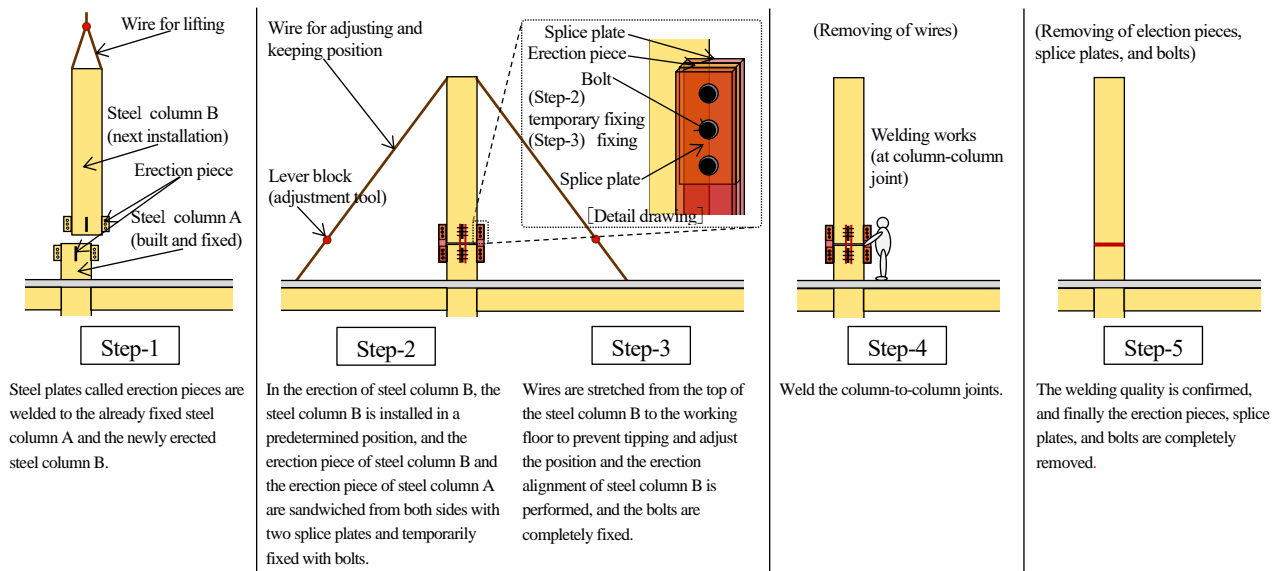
The procedure from erection work of steel columns to joint welding work in construction (as example)
